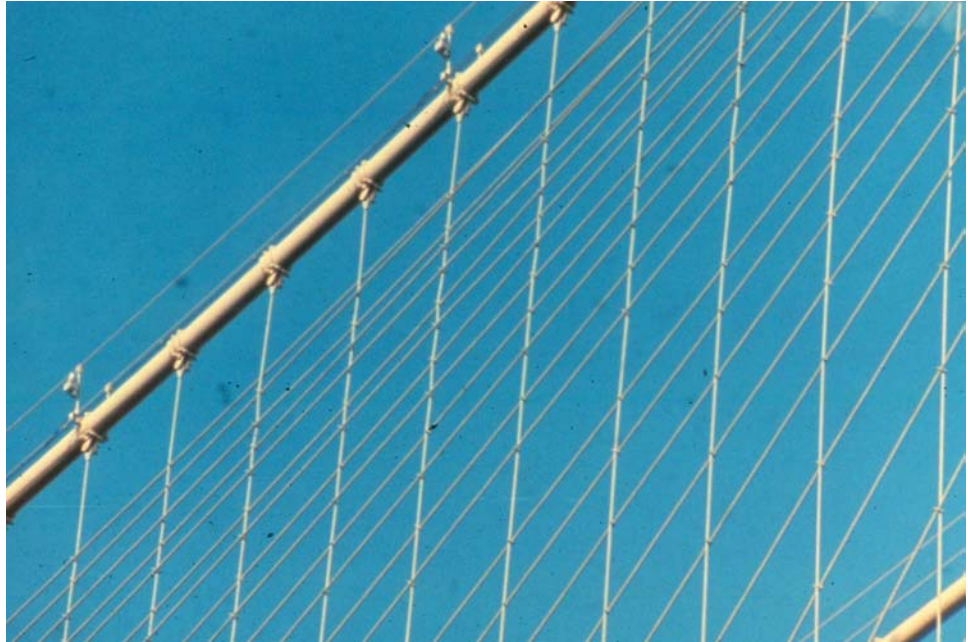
Close-up of Brooklyn Bridge Diagonal Cable-Stays
